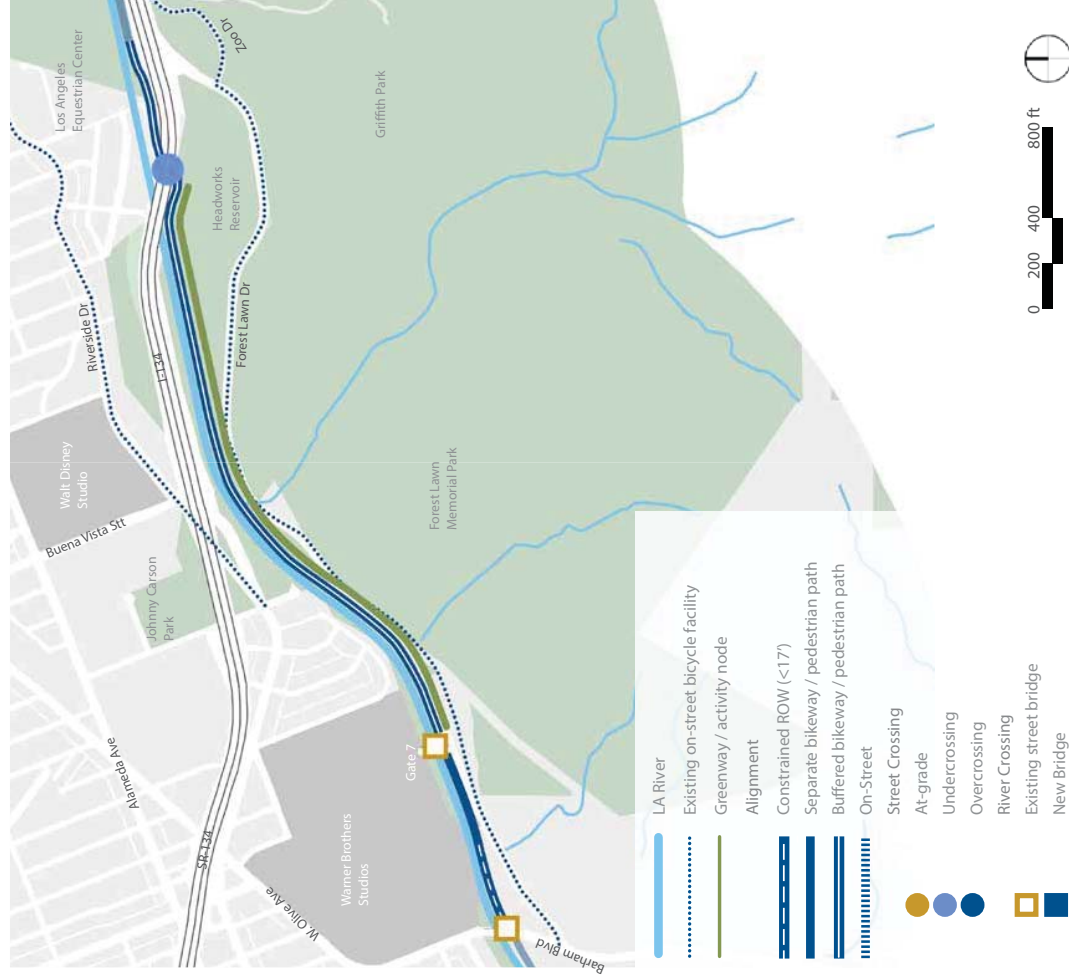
Barham Boulevard to Zoo Drive - Segment 09 Concept Alignment
